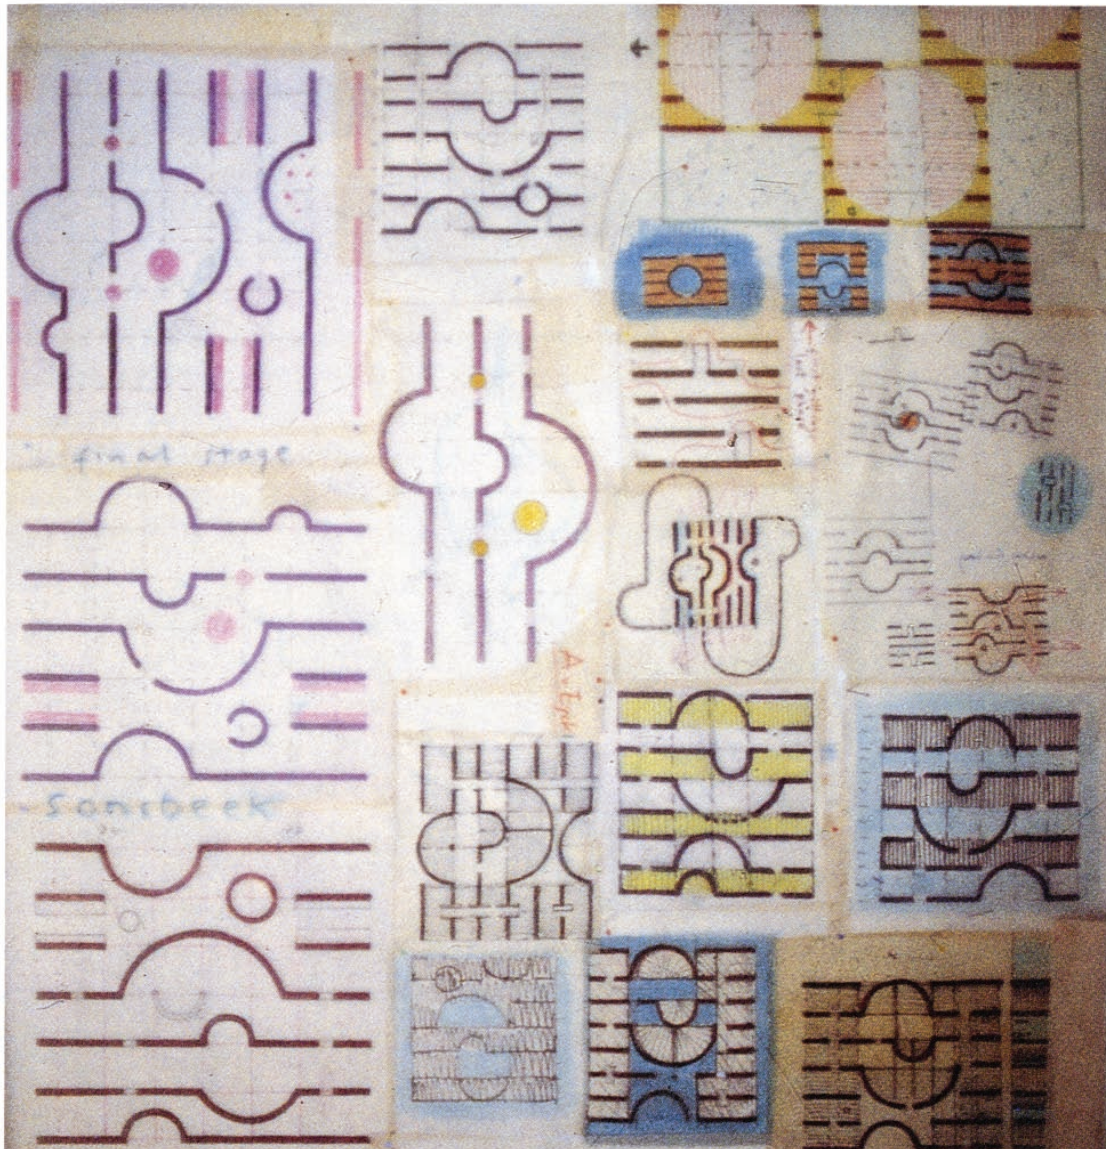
Design development of the Sonsbeek Pavilion's plan.
